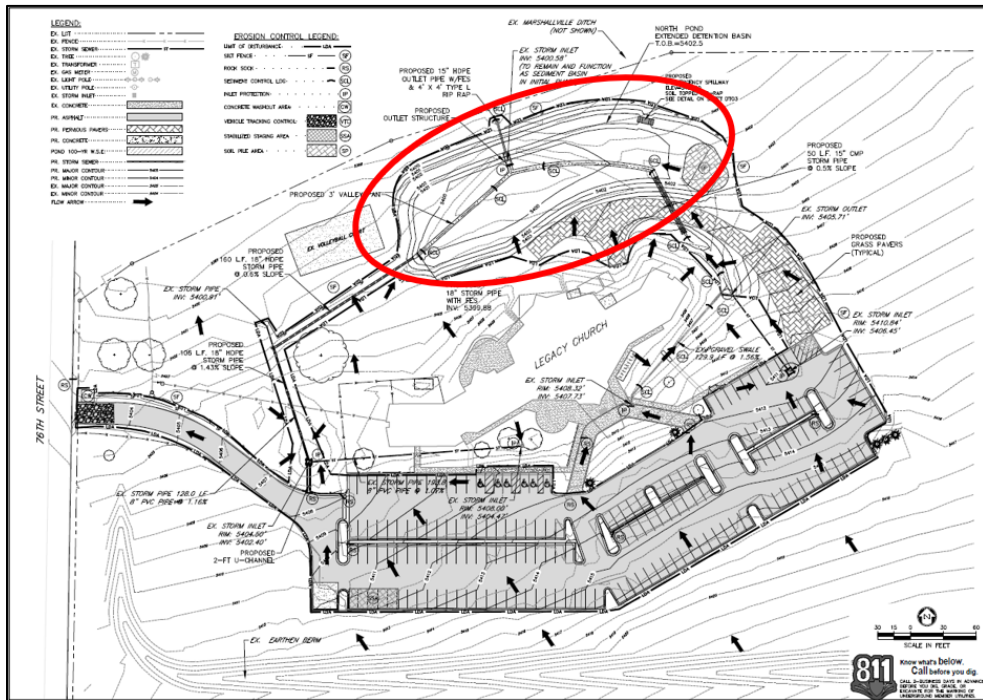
October 2023 drainage plan, with detention pond location indicated in red.
